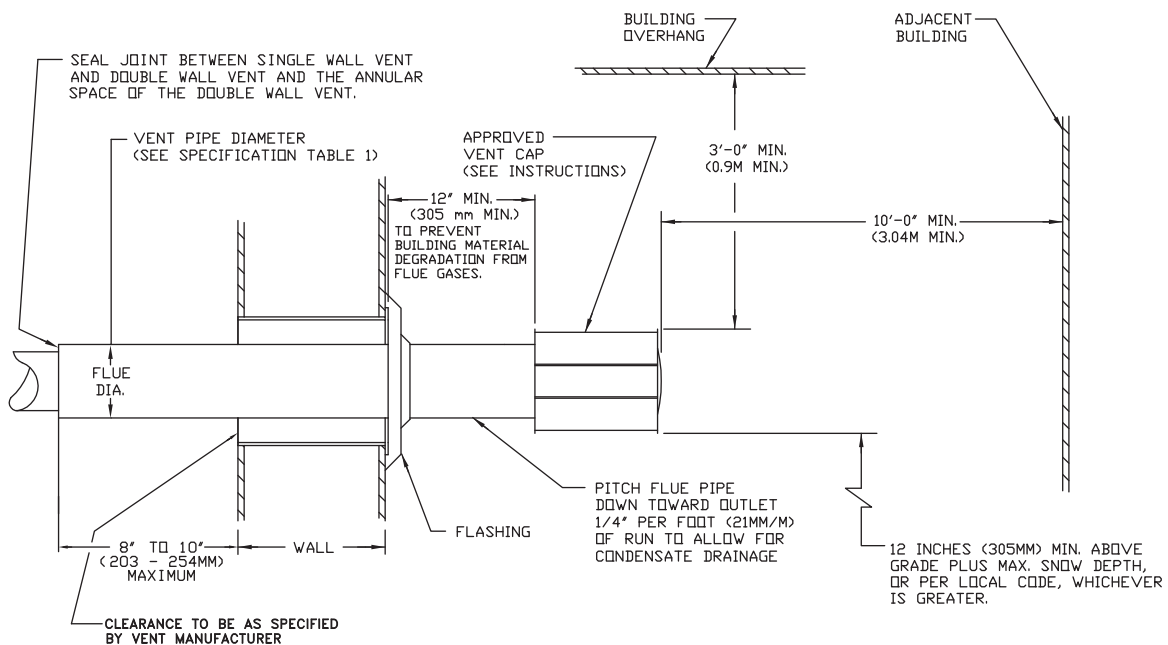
Horizontal arrangement, single wall vent system to double wall termination; see Table 7 vent systems termination clearance requirements
